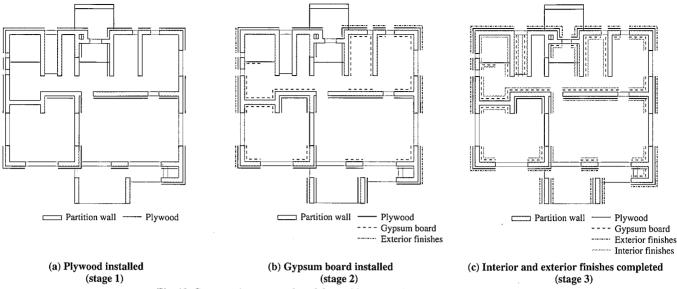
Construction stages of steel-framed house subjected to vibration test
